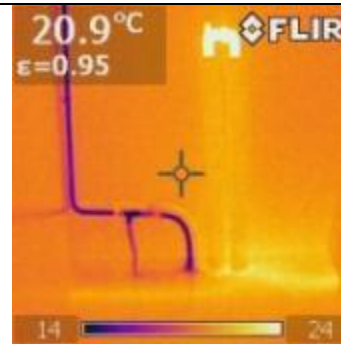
One pipe heating system inside concrete joists is distributed through the clothes cupboard
